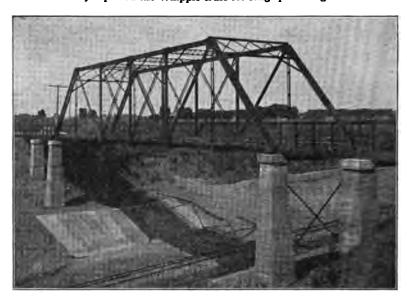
Through Riveted Pratt Truss, 111' 6" Span, Over Illinois and Mississippi Canal.
